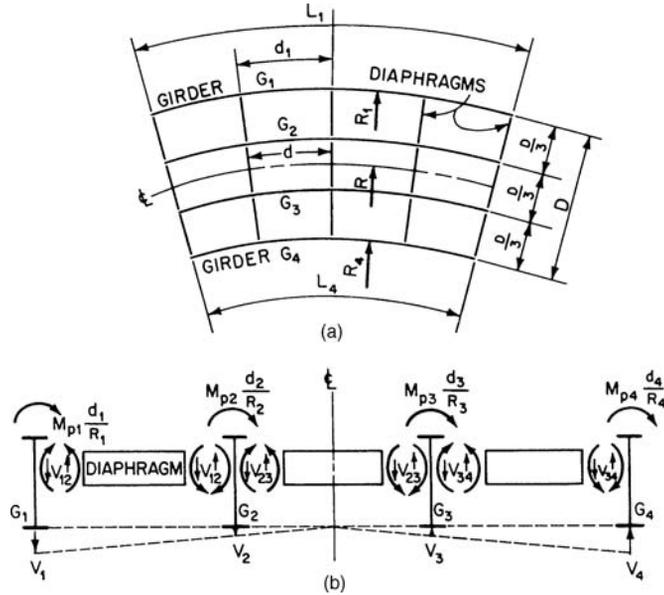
Curved-girder highway bridge. (a) Framing plan. (b) Cross section through the bridge at a diaphragm.
